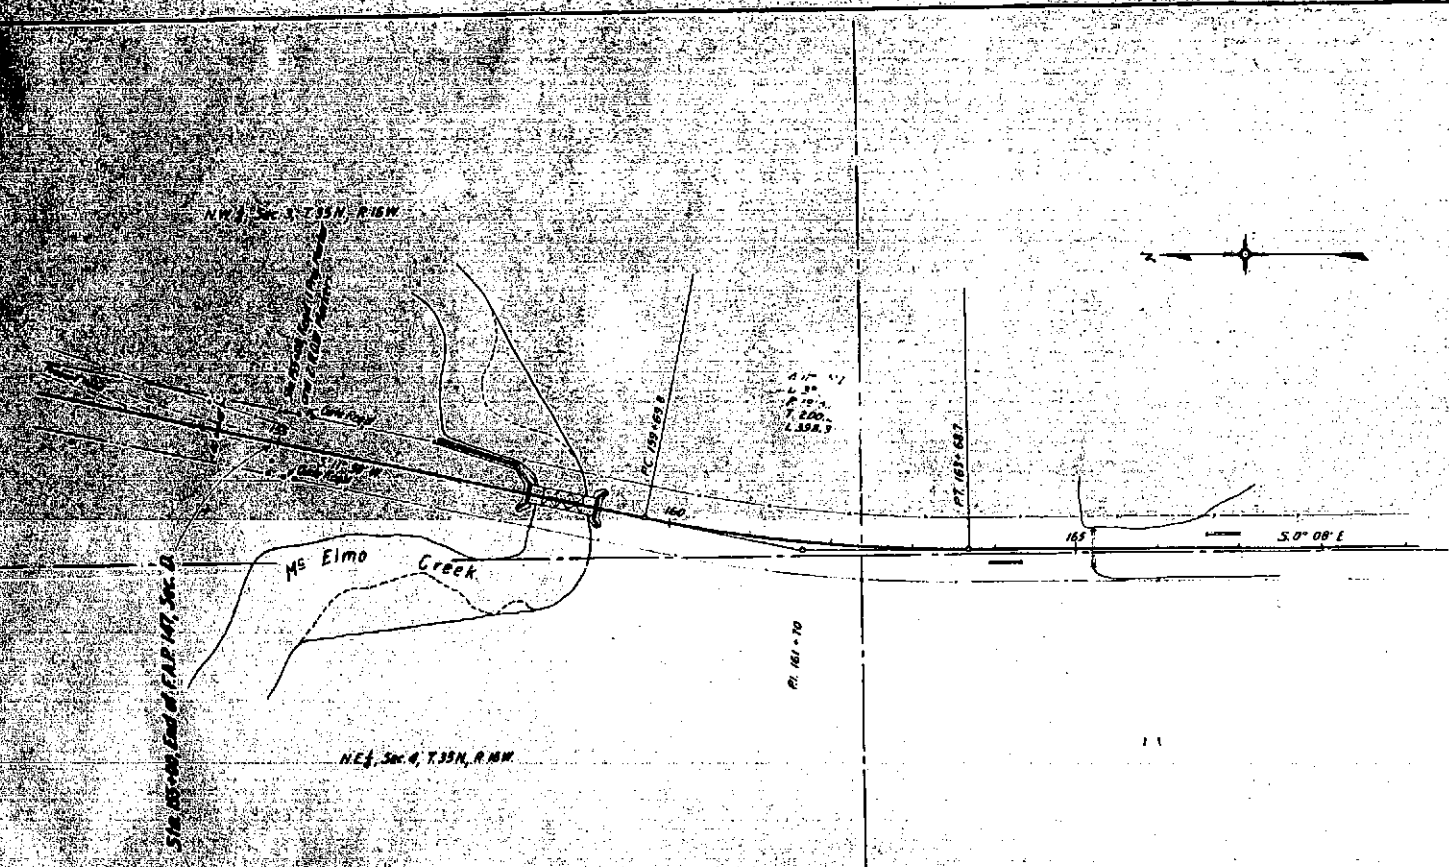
PLAN PROFILE - P. 1 & 2 STANDARDS
